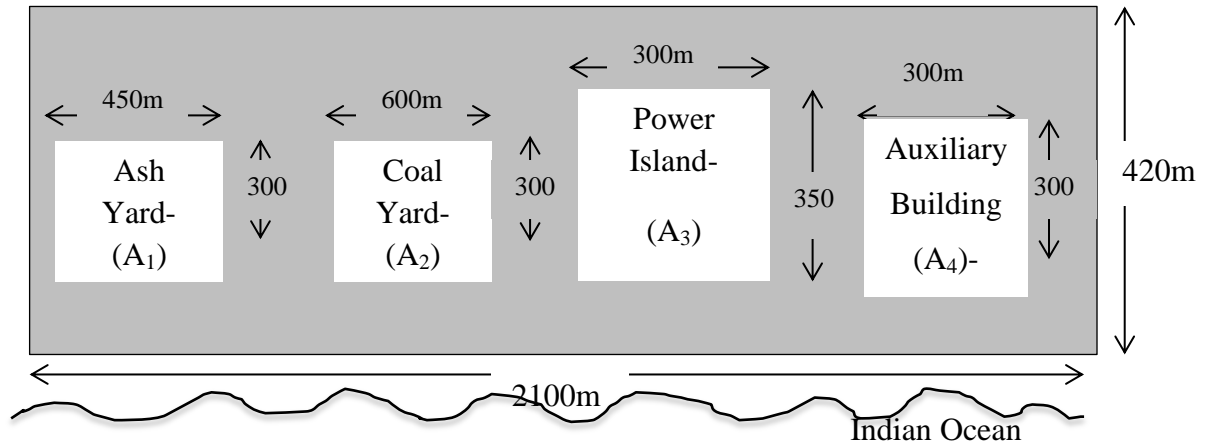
Building utilisation in site of Norochcholai power plant
